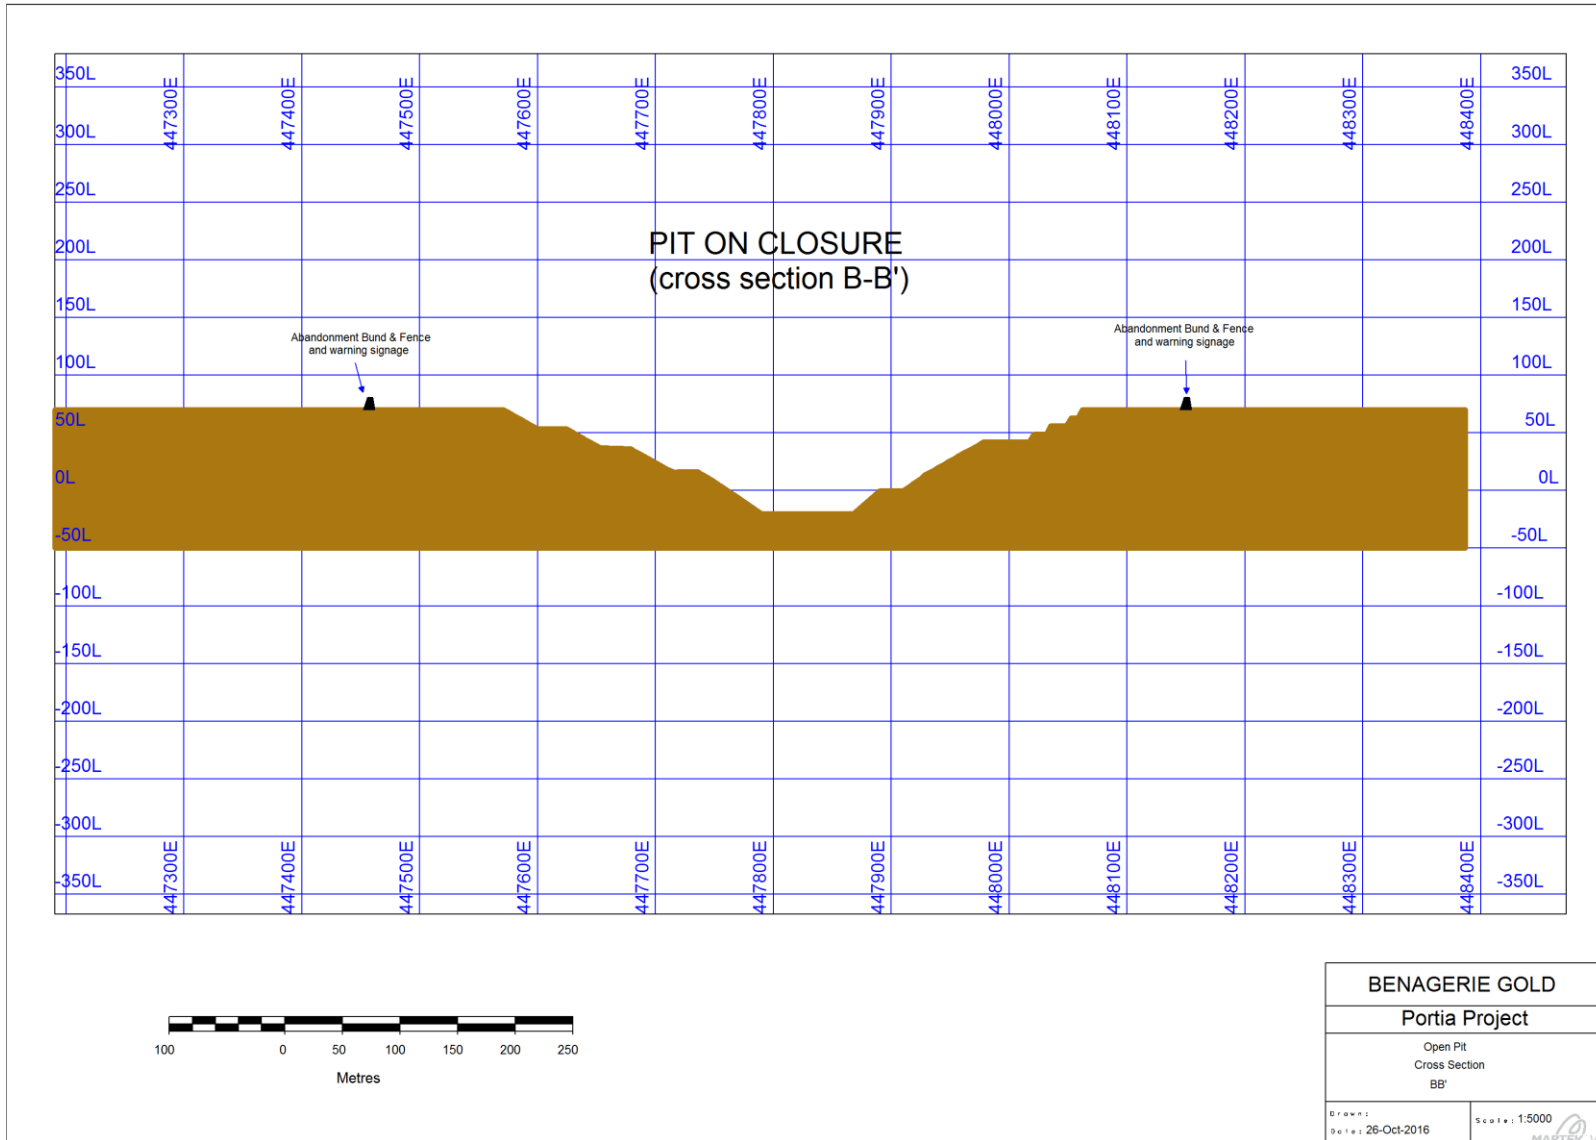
Cross-section B-B' of Portia Open Pit on Closure
